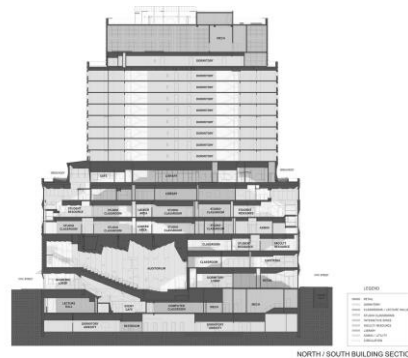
Section of University Center in New York (ArchDaily, 2014).
